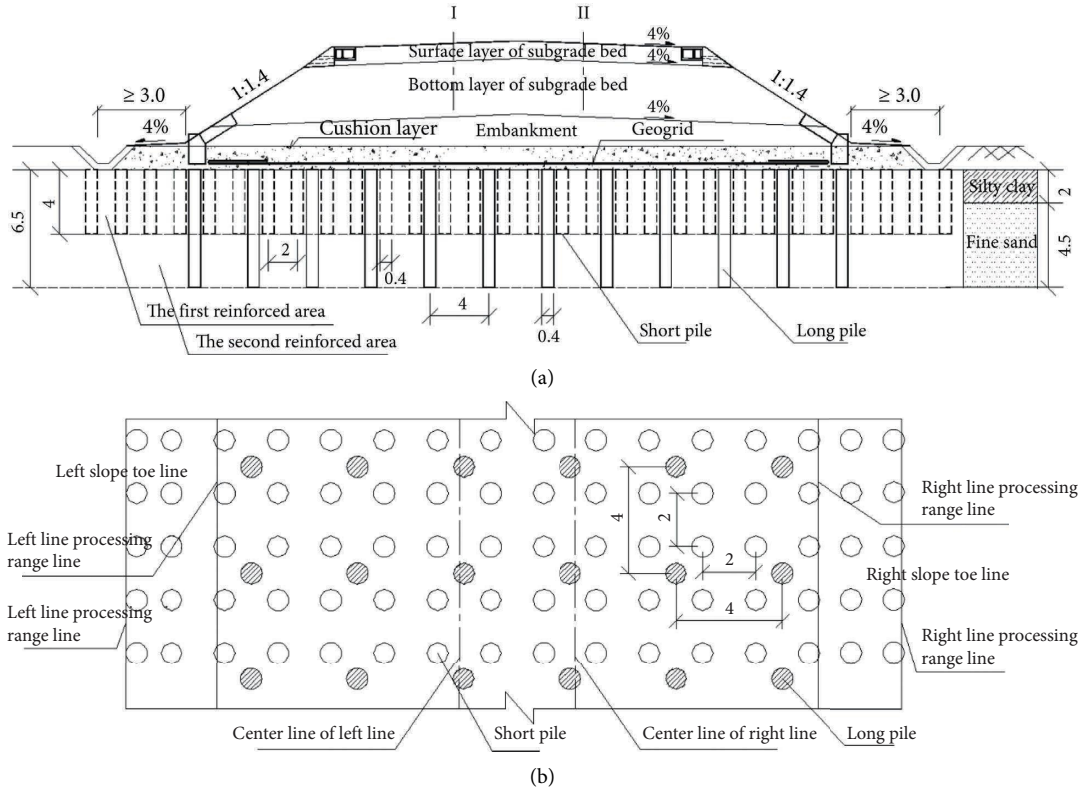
Design drawing of prototype long-short pile composite foundation treatment (unit: m). (a) Cross section of long-short pile composite foundation treatment. (b) Long-short pile composite foundation treatment plan.
